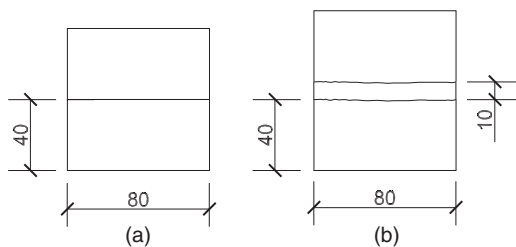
Masonry specimens; (a) dry joints; (b) mortar joints.
